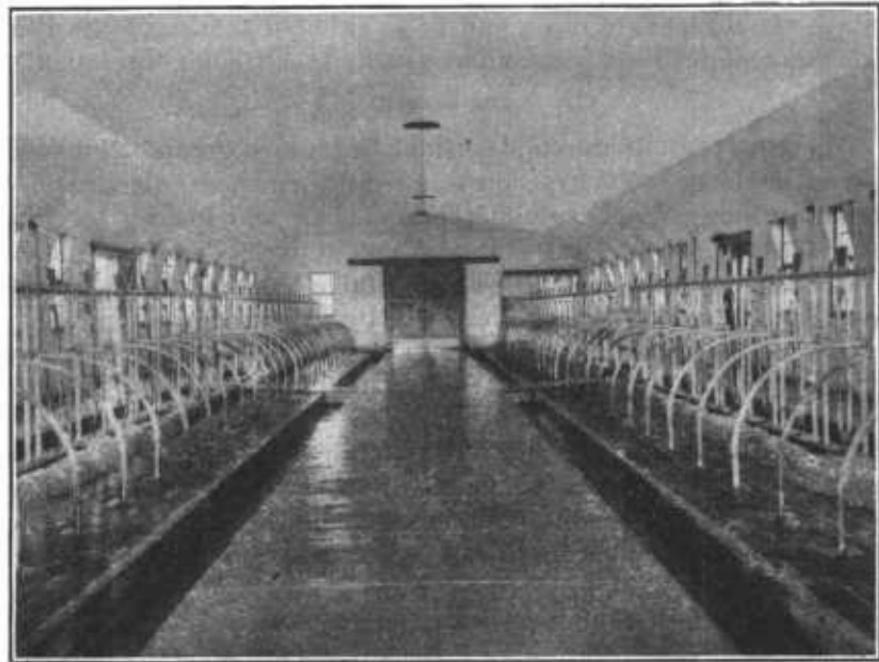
Interior of the dairy stable on the farm of the U. S. Naval Academy. The construction is such as to minimize the labor necessary to keep floor, walls, ceiling, and stable fittings in a clean and sanitary condition.
